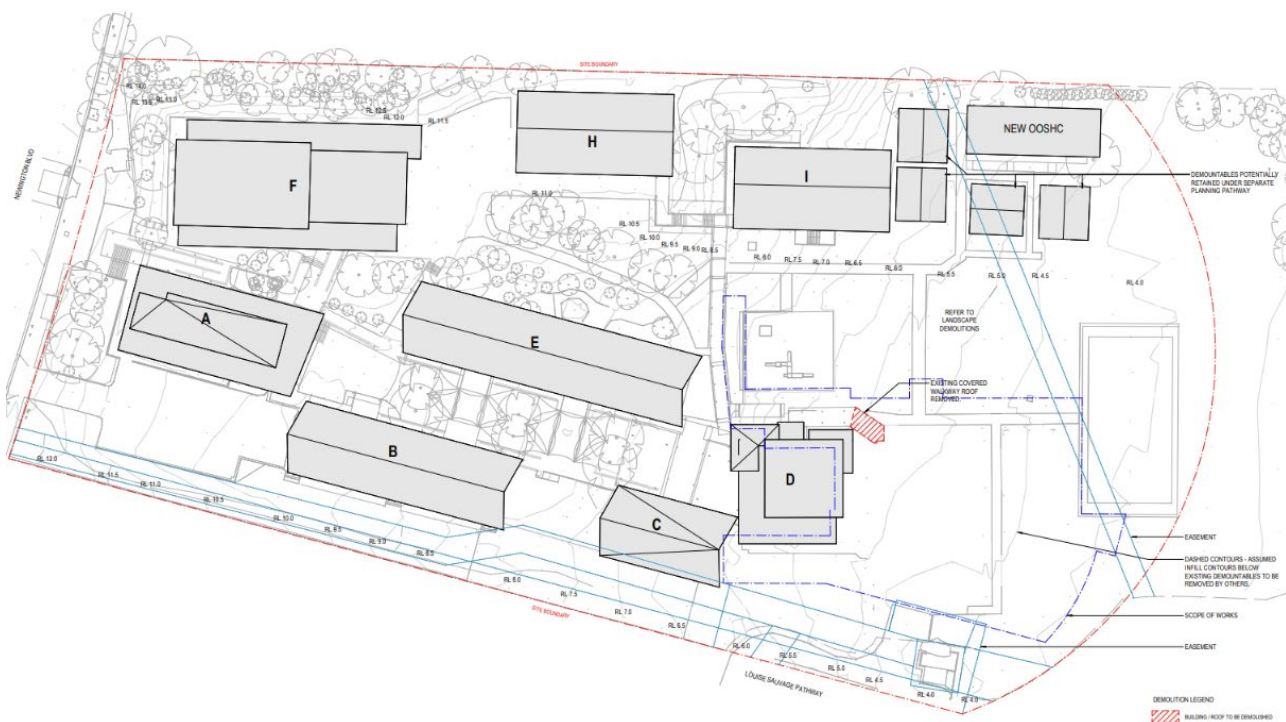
Proposed indicative demolition plan (Source: Architectus)
